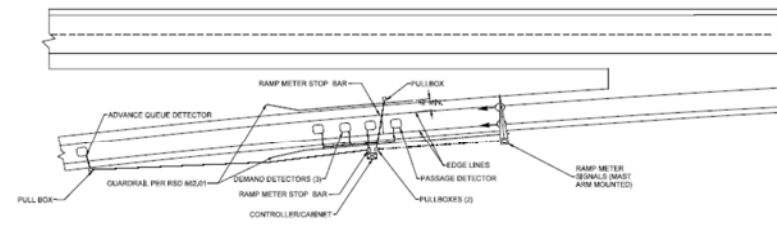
Two Lane Ramp Meter Signalization and Equipment Layout
